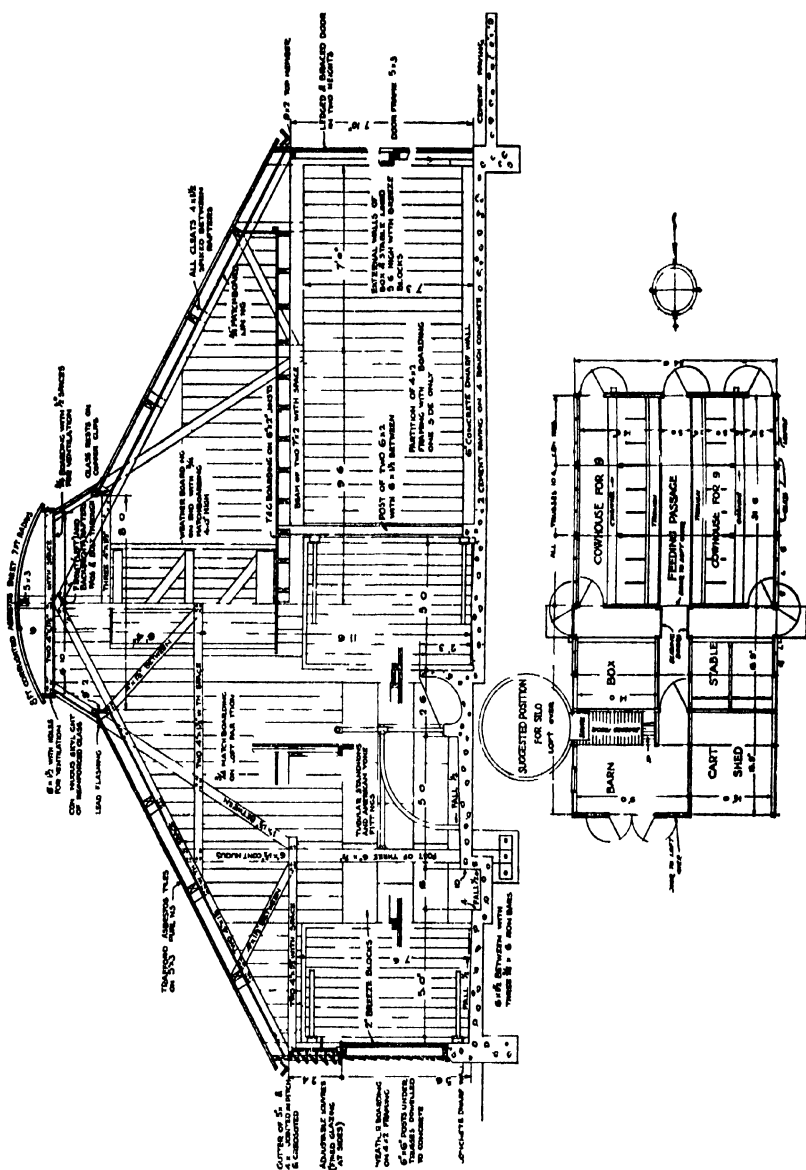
Plan and Section of suggested Standardisation of the Hexham-hire Farm Building.
